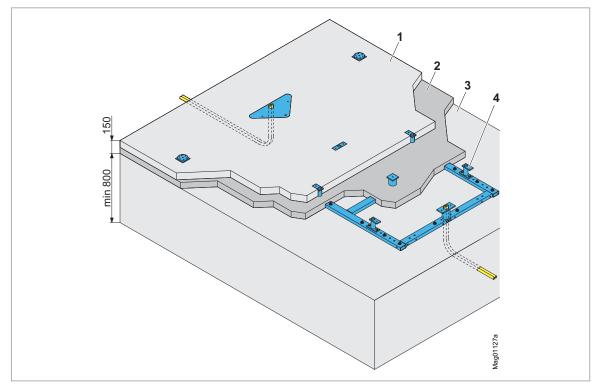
Example of foundation structure with empty conduits, floor covering and base frame (dimensions in mm)
